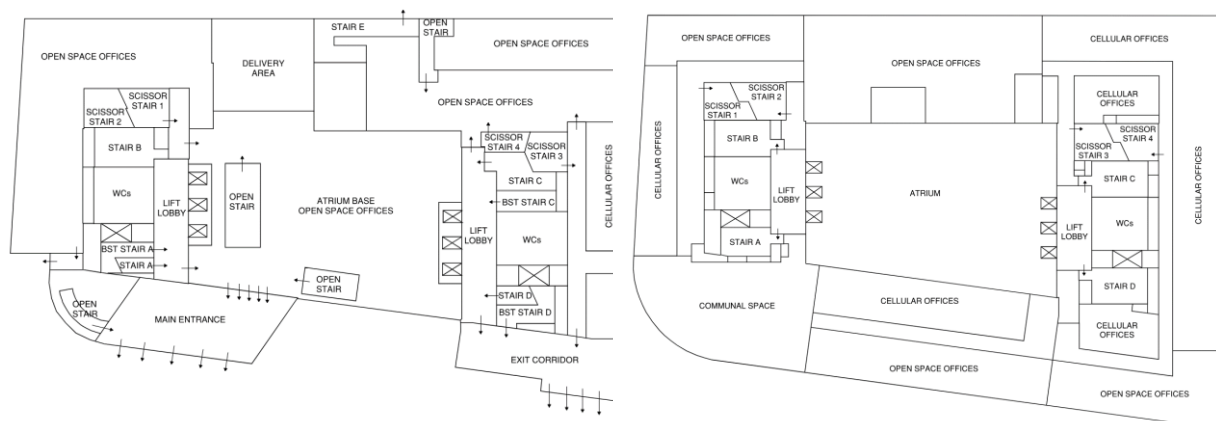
Schematic views of the ground floor (left) and a typical upper floor (right)
